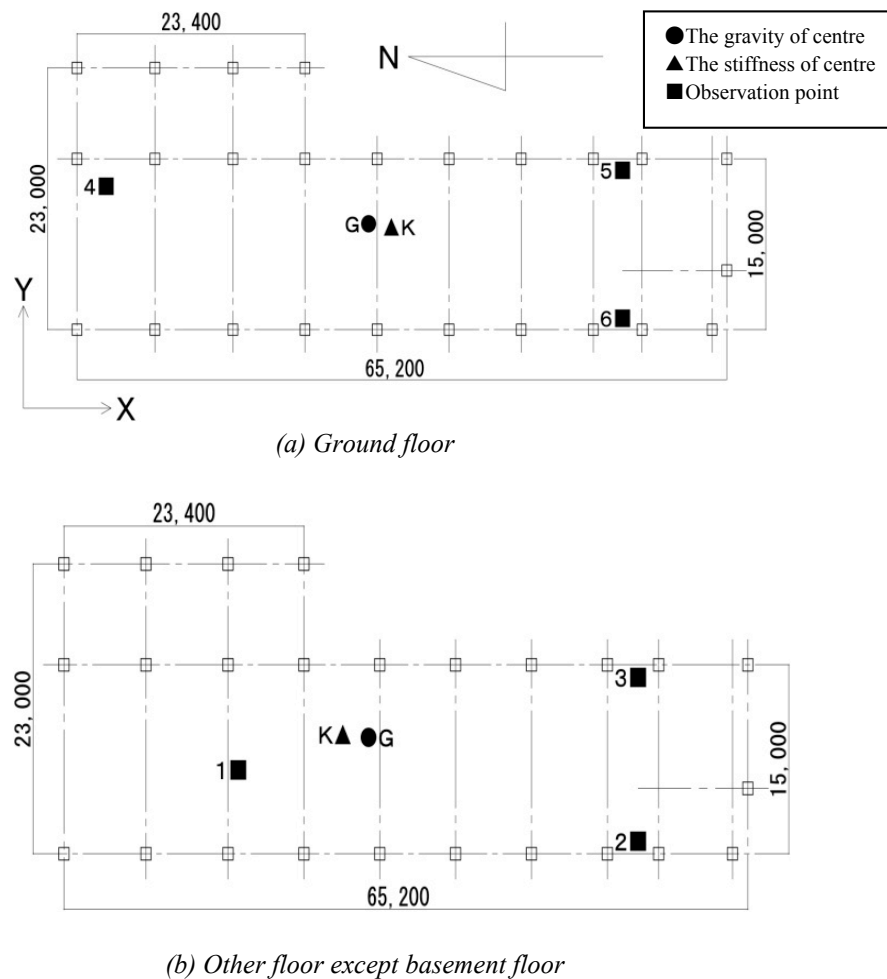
Observation points on the plan of building #10 of (a) ground floor and (b) other floor except basement floor.
